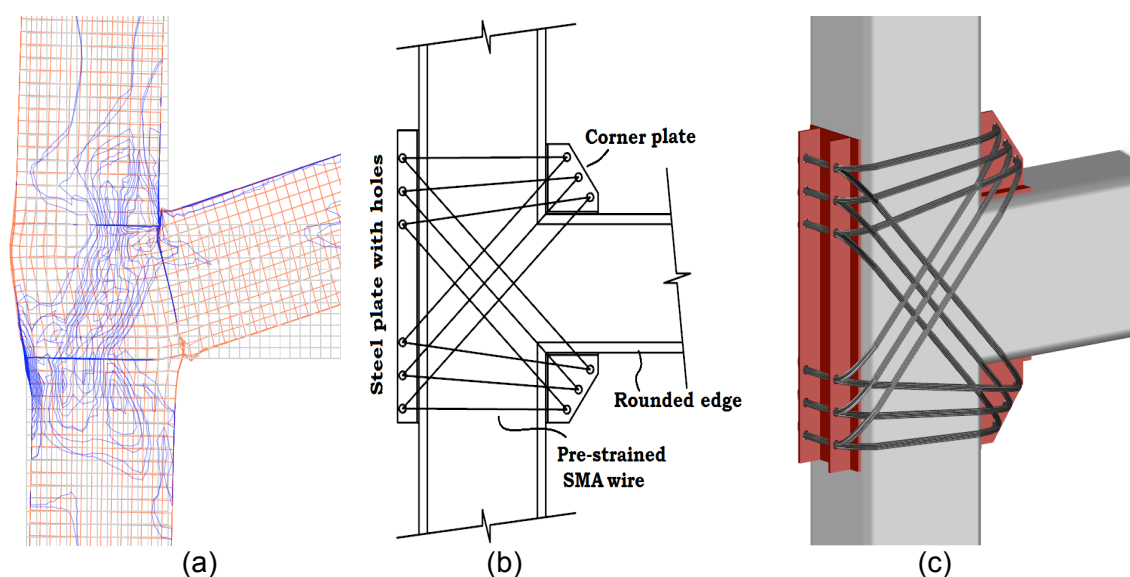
(a) Deformed joint core (scaled) and the associated von-Mises stress contour in a typical non-seismically detailed beam-column joint (FEM); (b) schematic of the proposed retrofitting strategy (S-1); and (c) 3D enlarged view of the S-1 showing diagonal SMA loops and its anchorage arrangement.
